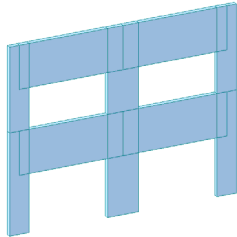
Modeling of open shear wall using MIDAS/Gen
